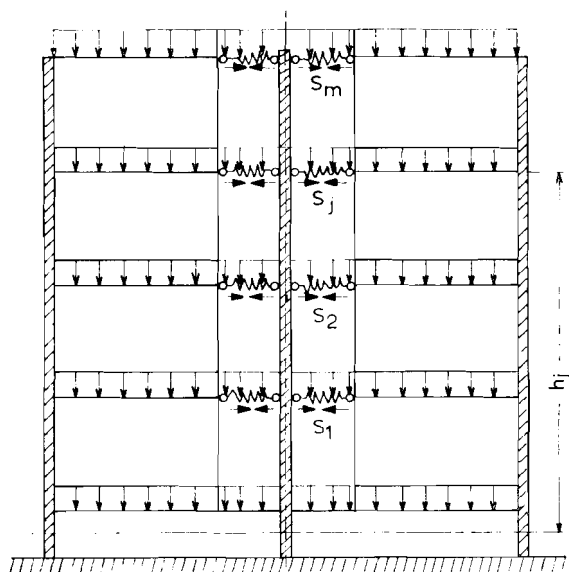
Design diagram of an inner transverse wall of a large-panelled building at bending in plane.
